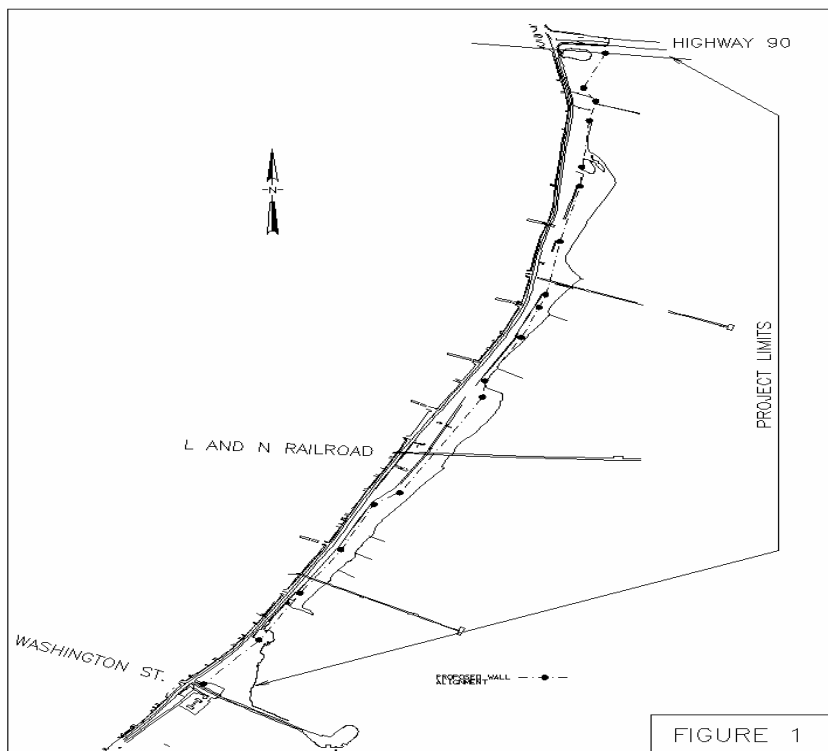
Downtown Bay St. Louis, Existing Seawall
